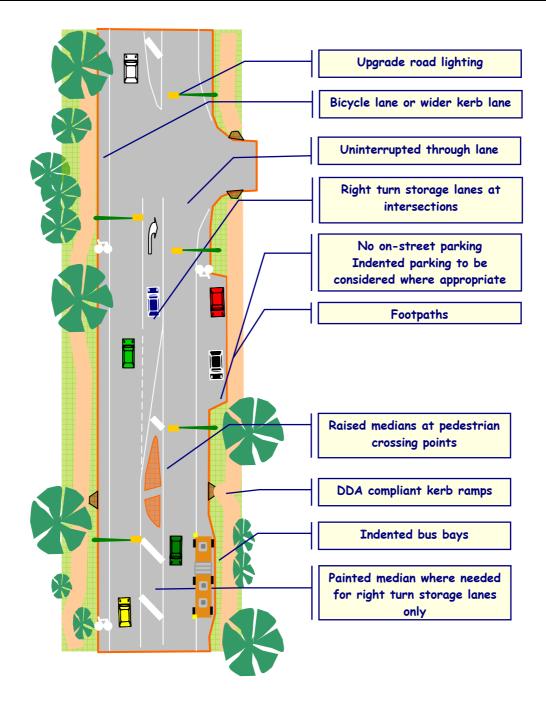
Typical Cross section of Golden Grove Road at side road junctions
